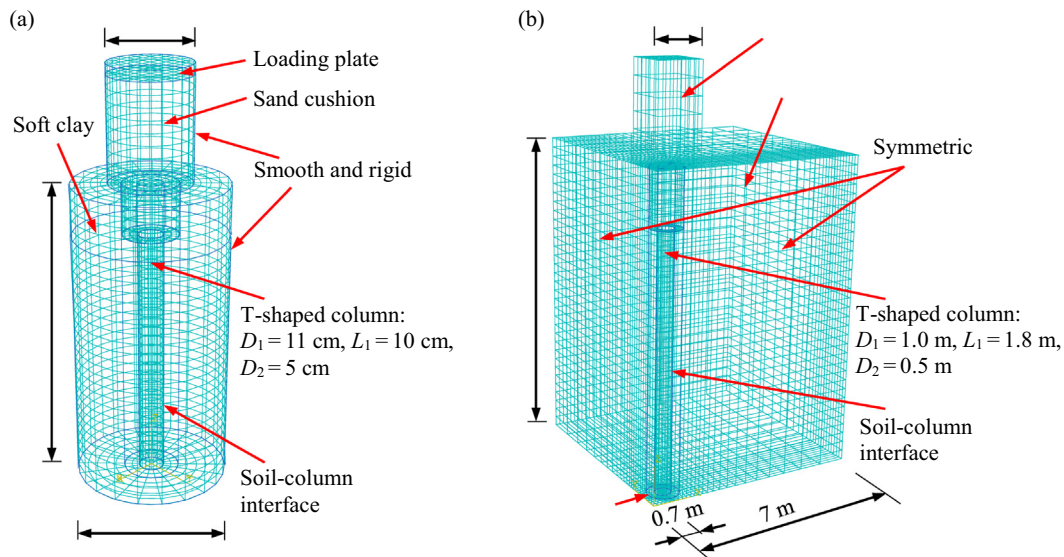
Finite element discretization of composite ground with T-shaped column: (a) model-scale laboratory test, and (b) parametric analysis.
